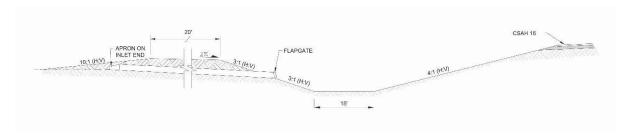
Typical Cross-Section Parallel to CSAH 16
